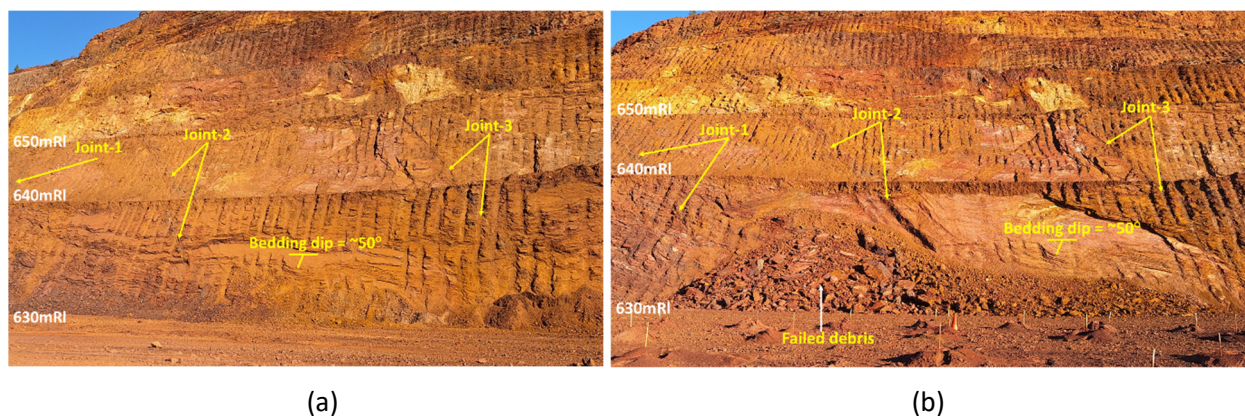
Overview of single batter crest failures in structurally controlled pit slopes. (a) Pit slope with undercut bedding planes and joints in May 2024; (b) Pit slope with failure in June 2024
